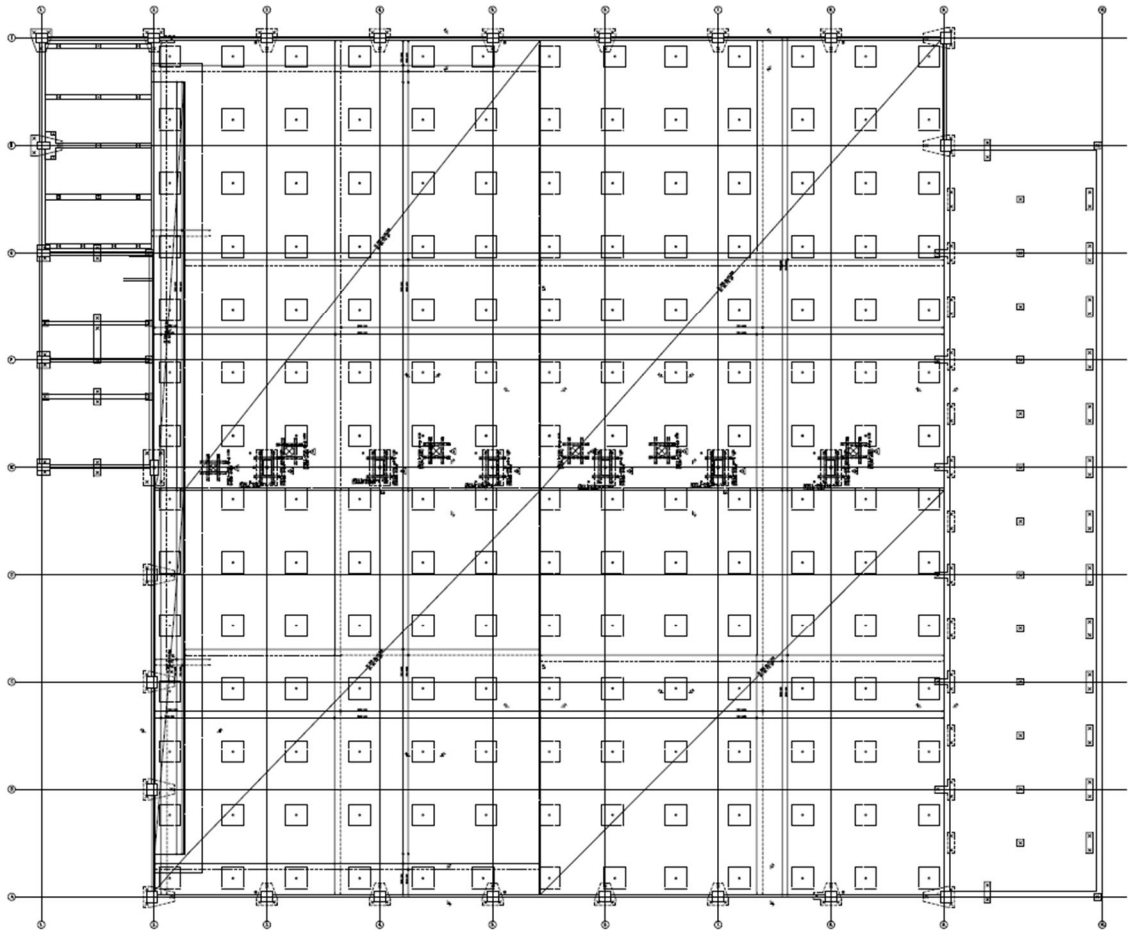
Configuration of the pile foundation mesh. Distance between piles: 5.5m (Mehto 2010)
